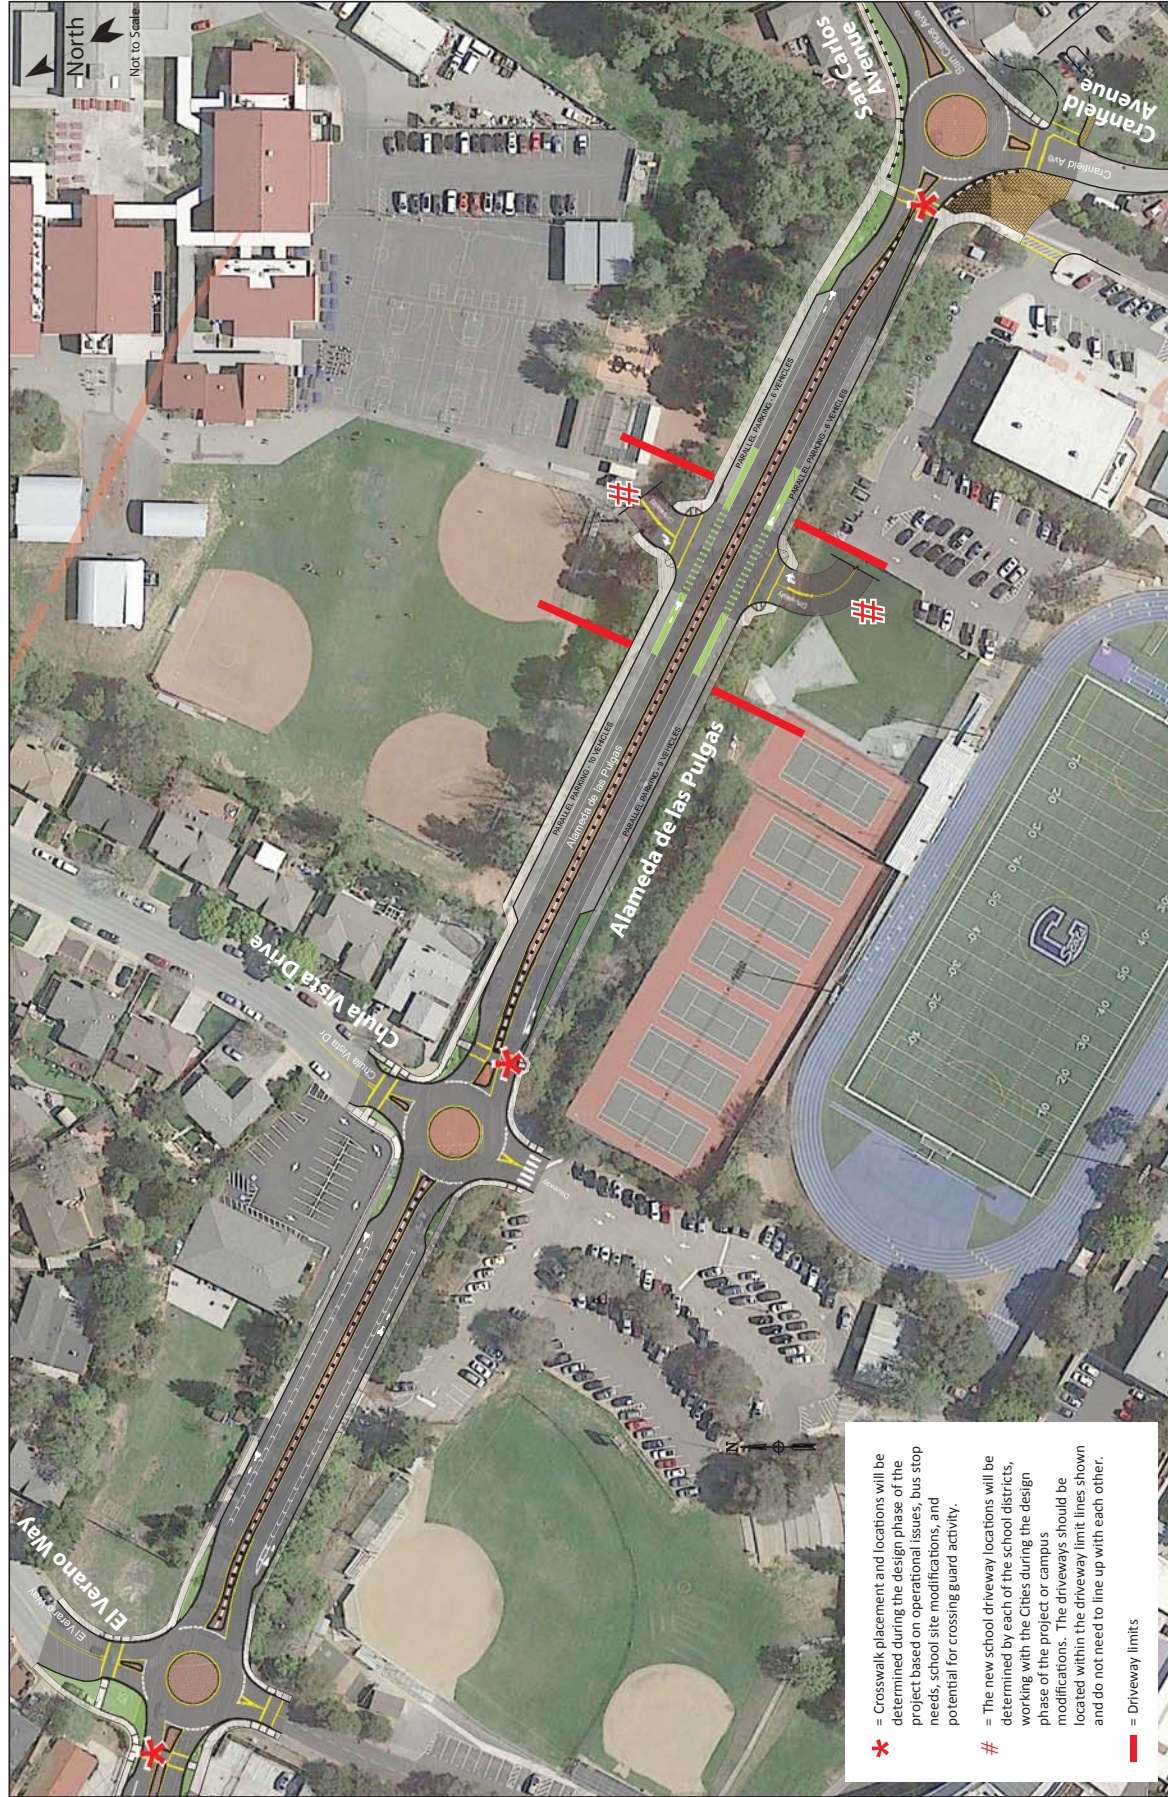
A - Alameda de las Pulgas/San Carlos Avenue Corridor Plan
